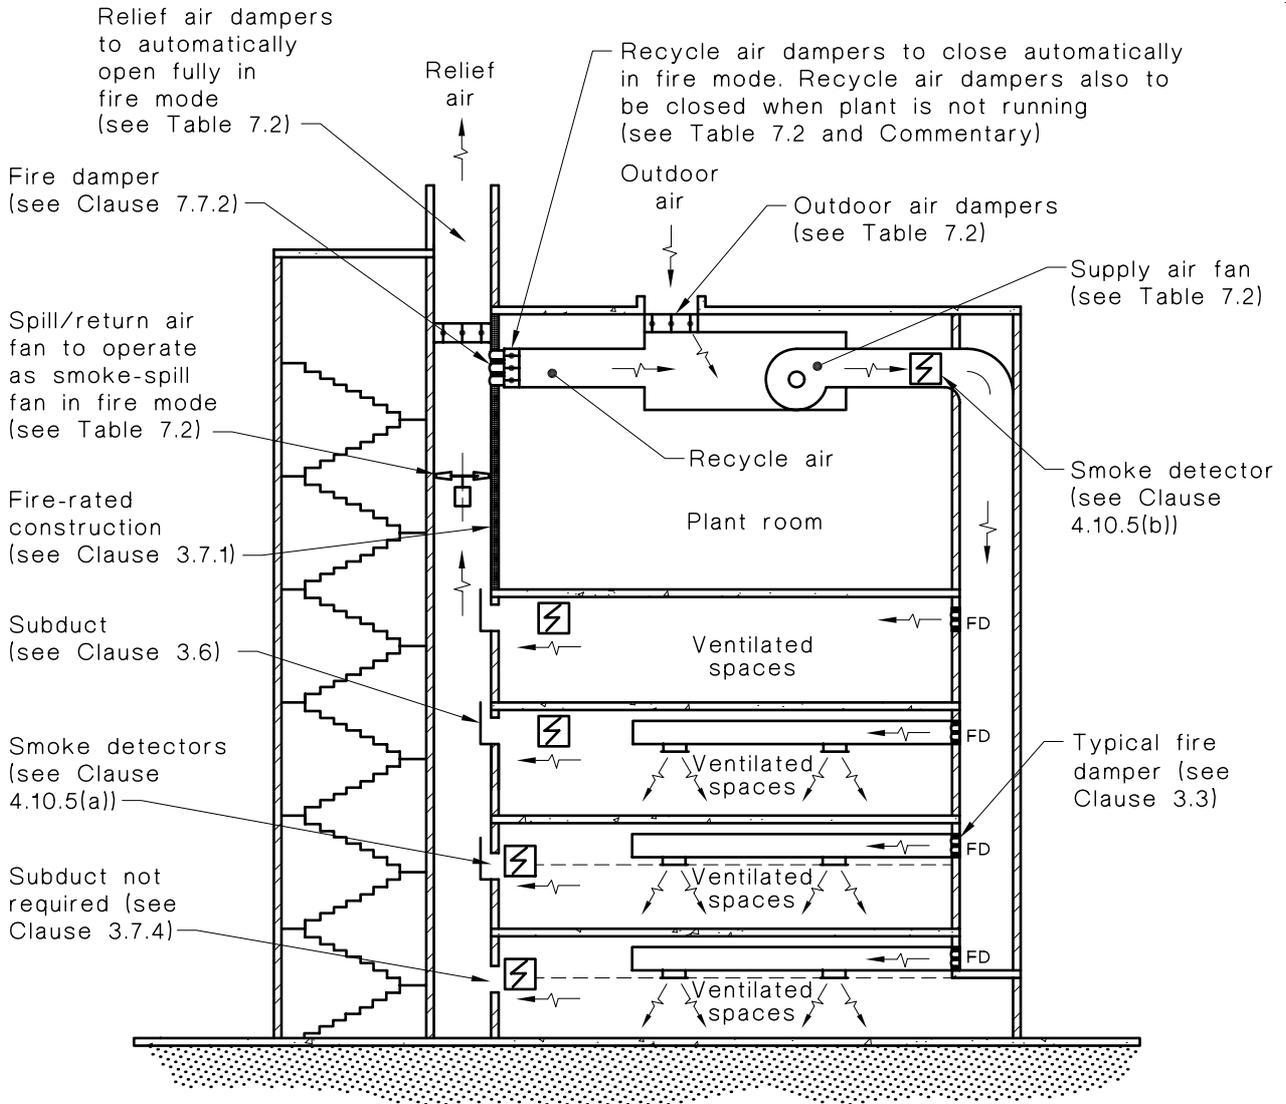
AIR PURGE SYSTEM—TYPICAL INSTALLATION WITH PLANT ROOM ABOVE SPACES BEING SERVED
